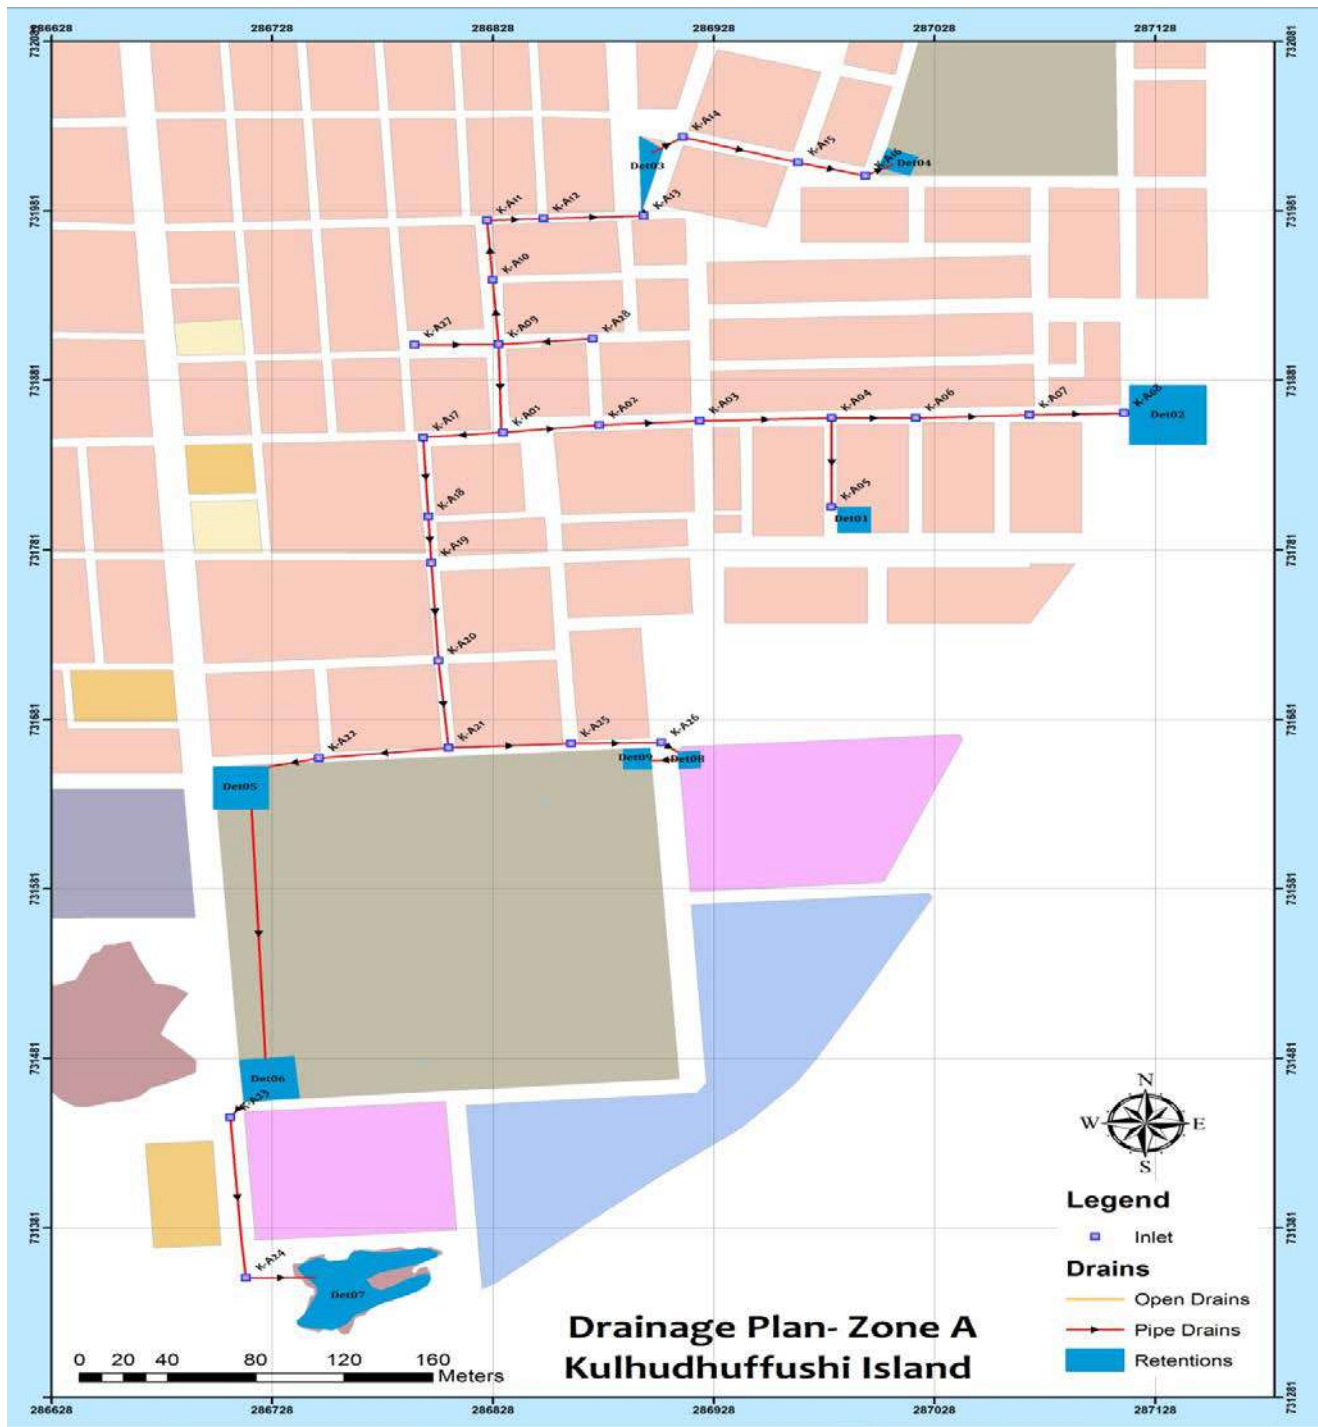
out Drainage plan Zone A – Hdh. Kulhudhuffushi Island
